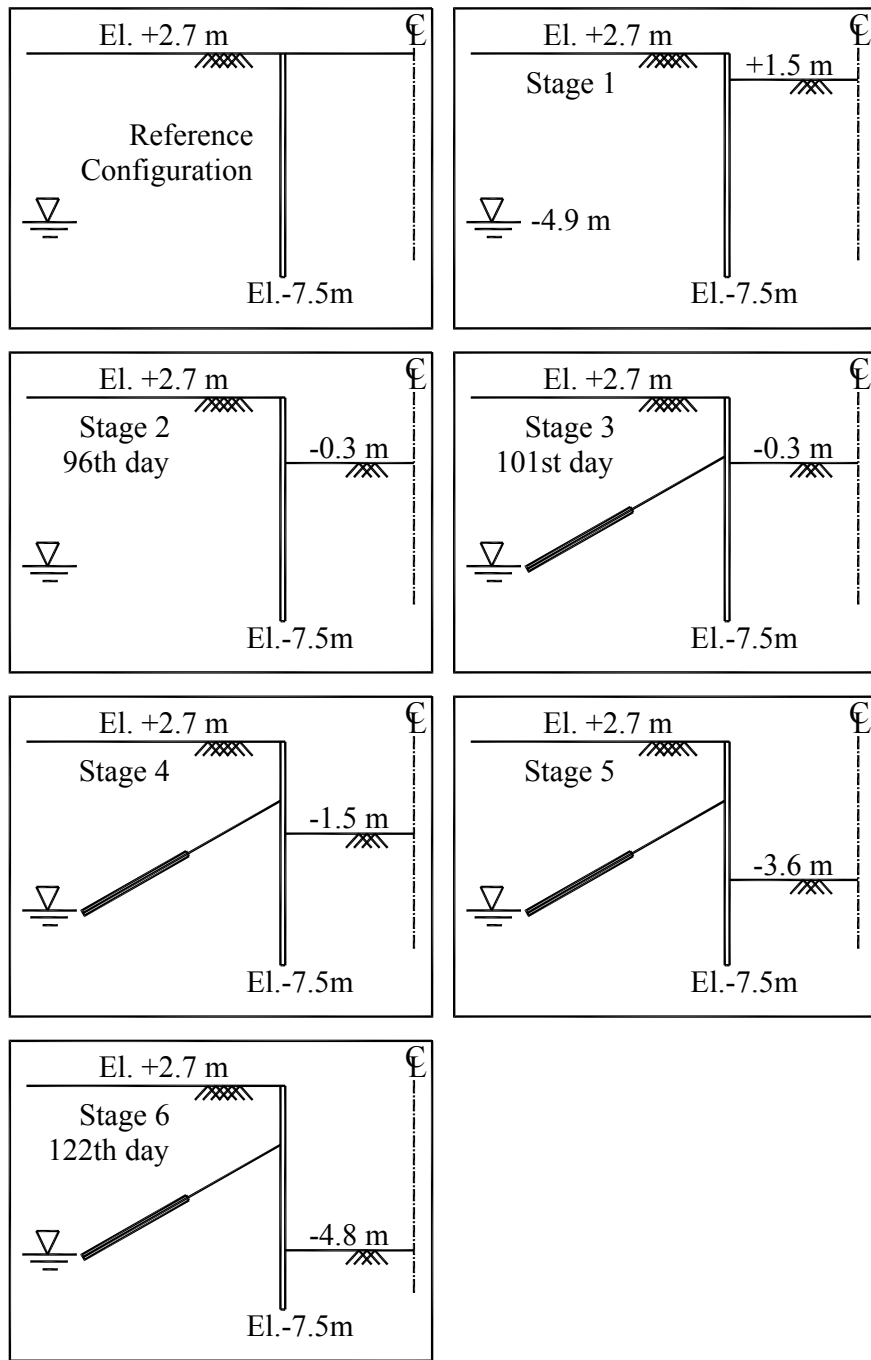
Construction sequence for single tieback section of the wall, Texas A& M excavation
